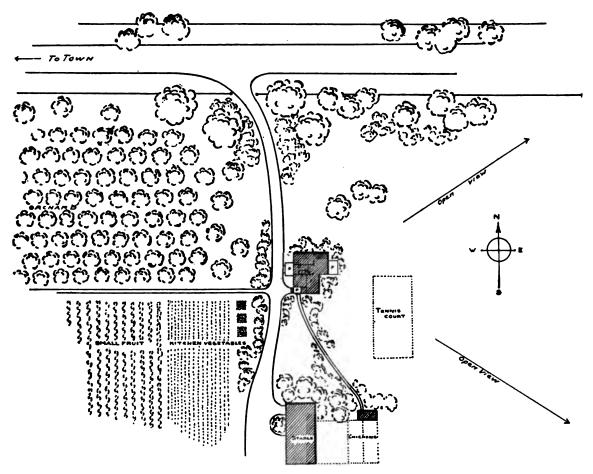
SUGGESTED ARRANGEMENT OF A FARM HOUSE, BUILDINGS AND GROUNDS FOR A NORTH FRONT.
